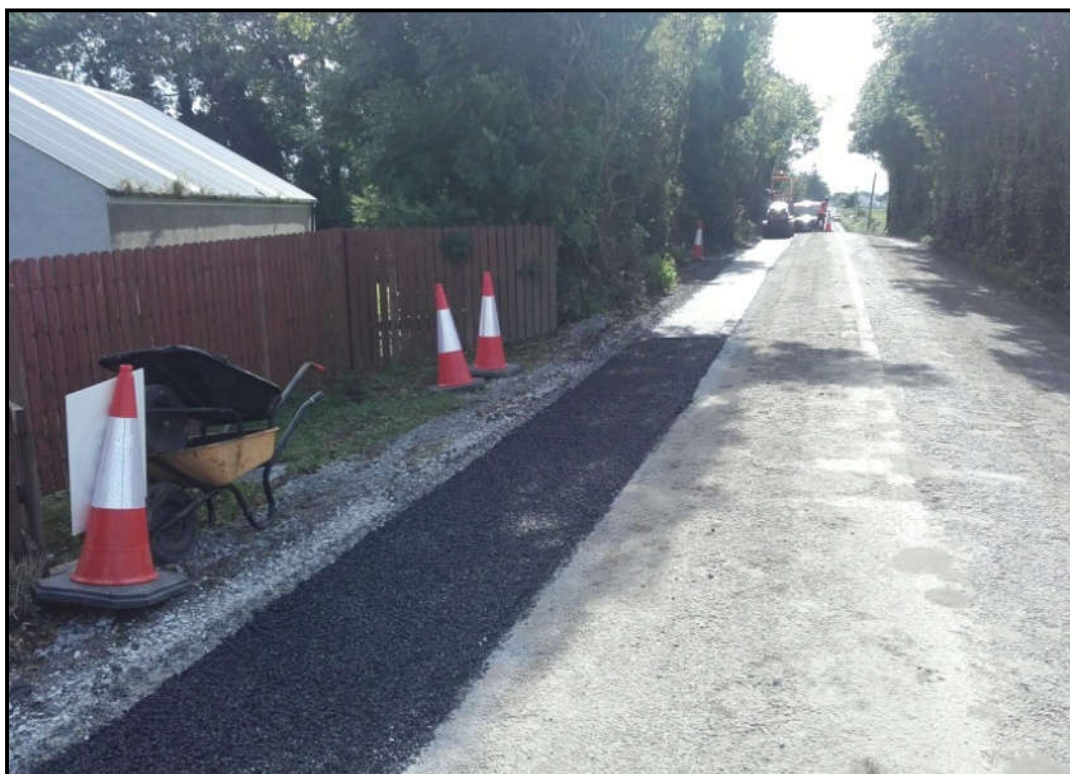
Grid Route example of the proposed permanent reinstatement works for a cable trench
